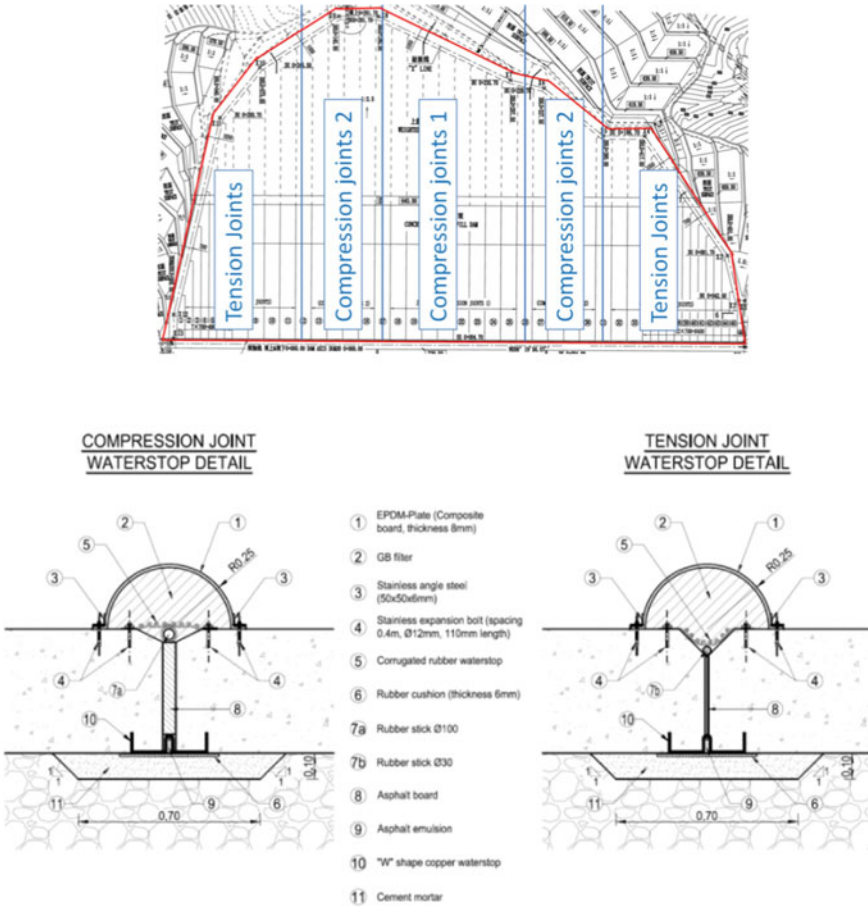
Plane view of the concrete face (top), details of vertical construction joints (bottom)
